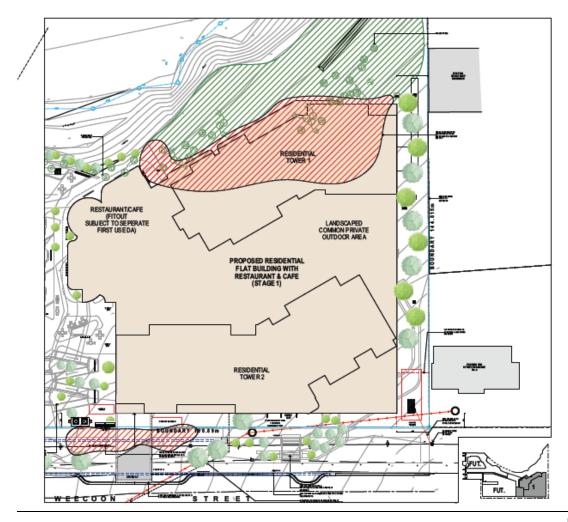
PROPOSED GROUND FLOOR PLAN:
